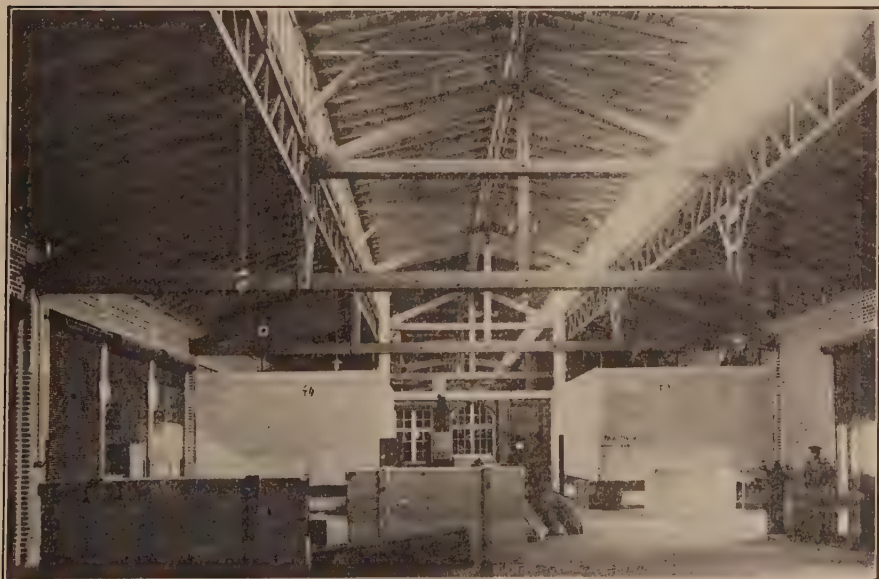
Roof truss for warehouse construction at Stuttgart Station, German Government Railways.
